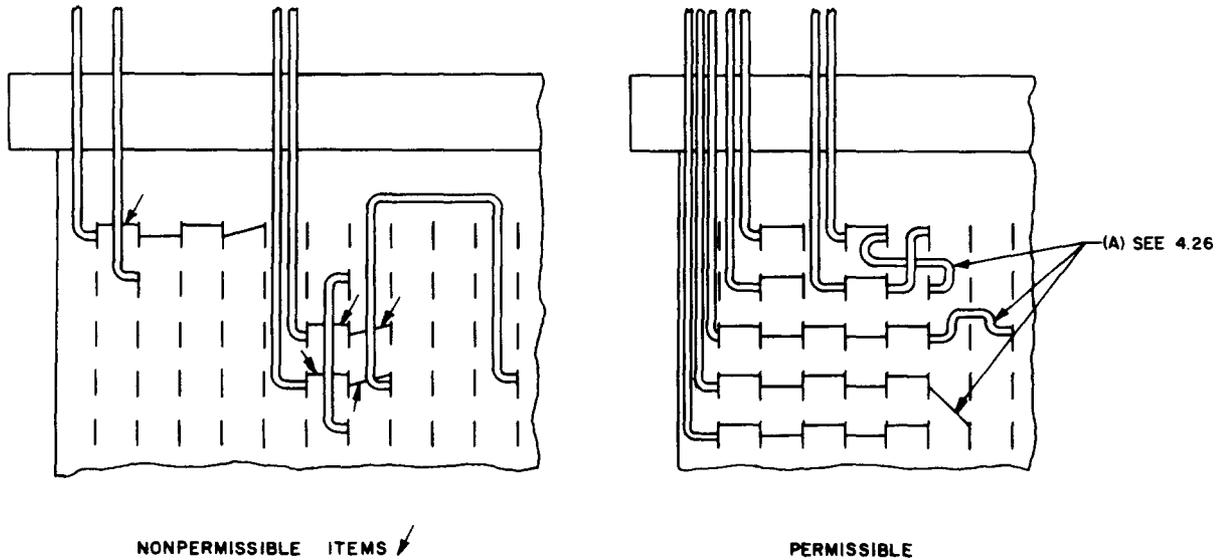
Typical Layouts – Distributing Frame Terminal Strips
